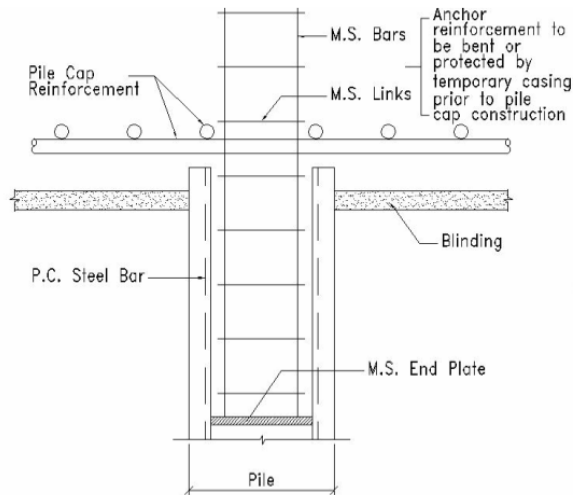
Typical Pile Head Details of a Precast Prestressed Spun Concrete Pile
